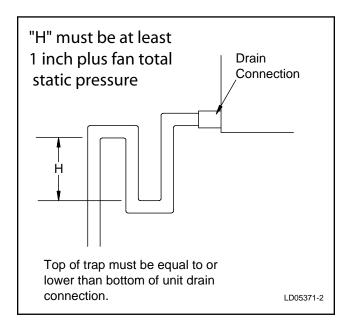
TRAP DETAIL FOR BLOW THROUGH APPLICATION
